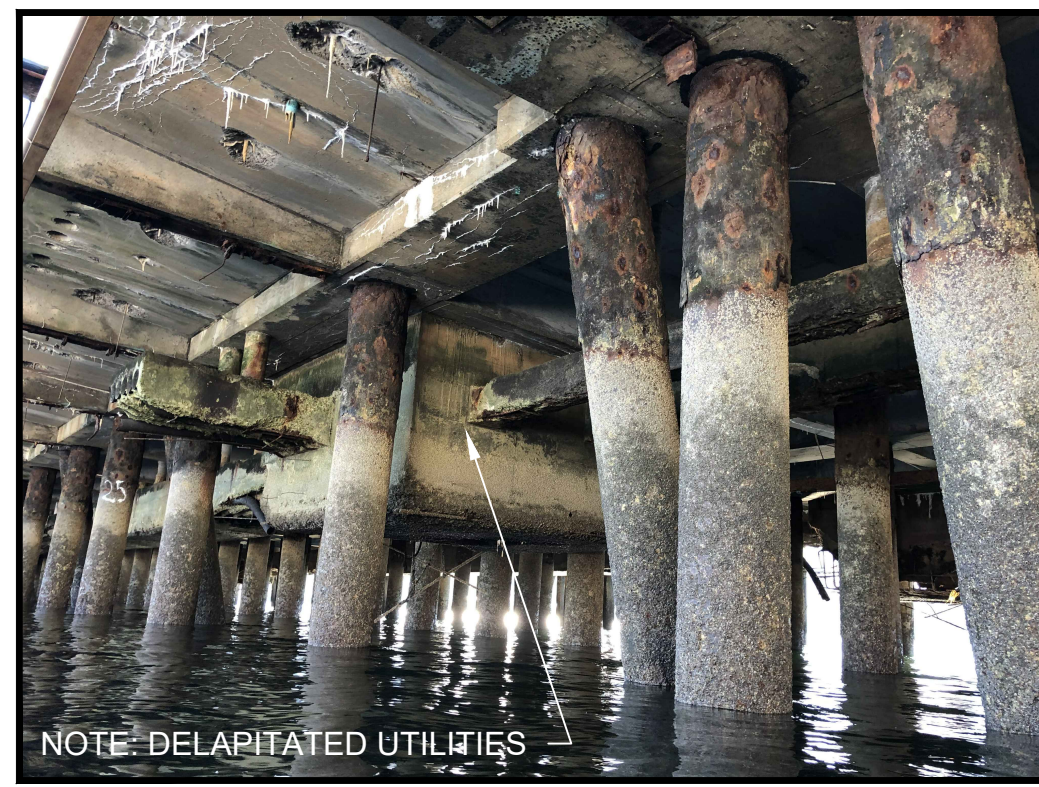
UNDERSIDE DECK LOOKING SOUTH NEAR BENT 21
